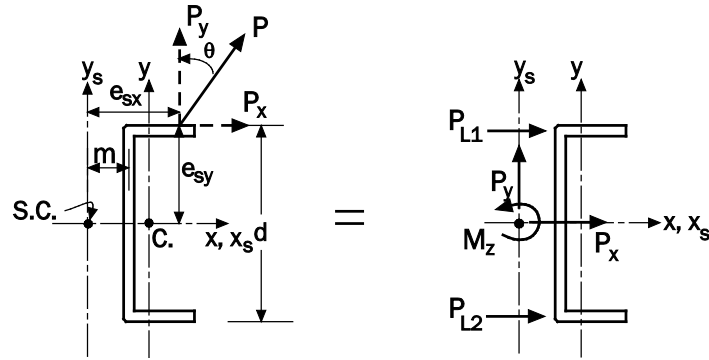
C-Section Member Subjected to a Concentrated Load
